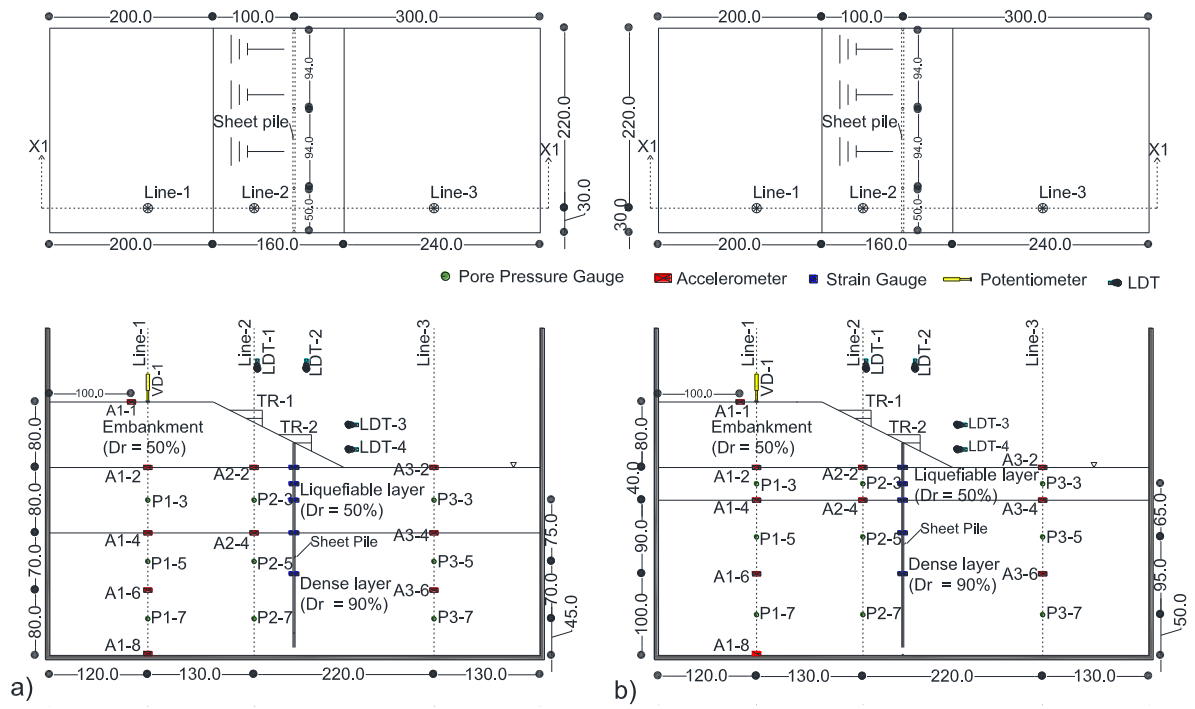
Plan and cross-sectional view of a) C-3 and b) C-4 (all the dimensions are in mm in model scale).
